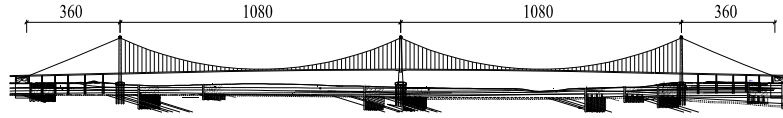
Elevation of the Maanshan Bridge (unit: m)
